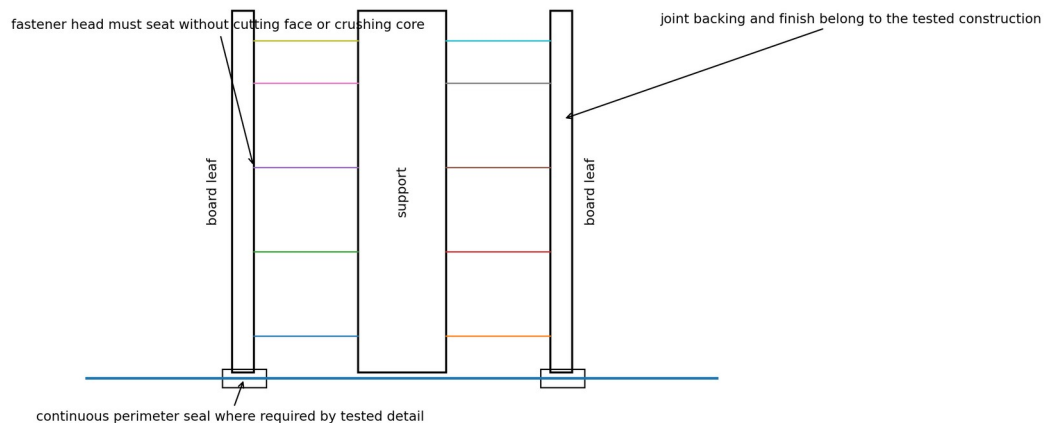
Joint, perimeter and fastening controls for a gypsum-board leaf. Author's original diagram. The drawing is conceptual. Project details must follow the applicable tested or evaluated construction.
